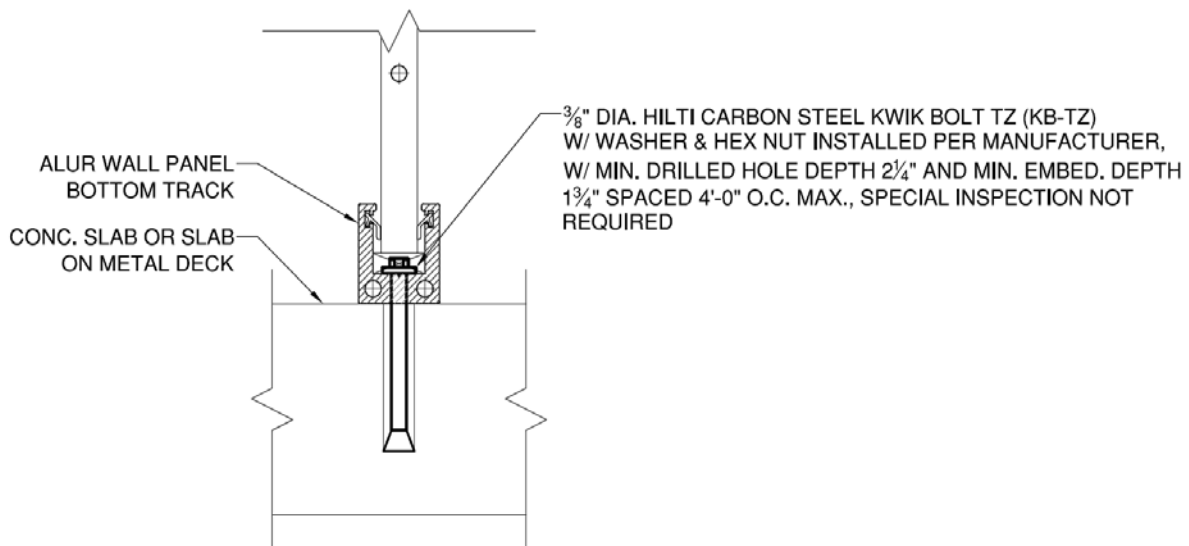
BOTTOM TRACK ANCHORAGE
